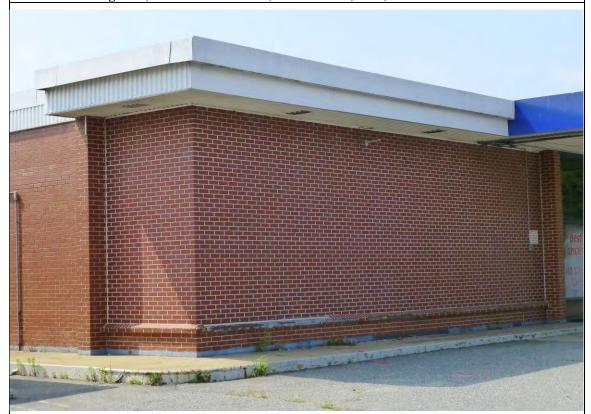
Building 1380, modified window opening on the left side of the northwest elevation (ERDC-CERL, 2014).
